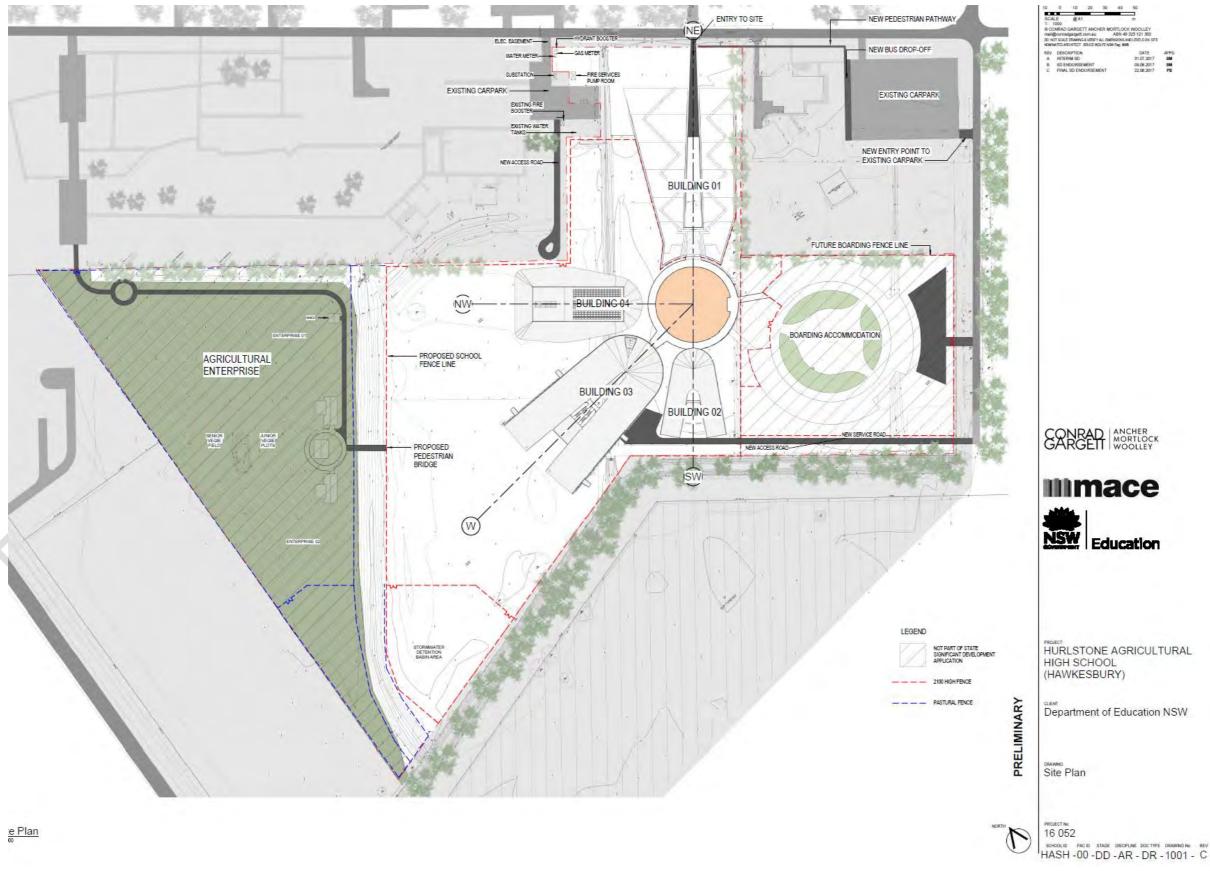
Proposed Site Plan Can'rad Gargett Ancher Mortlock Woolley (2017) HASH00-DD-AR-DR-1001-C
